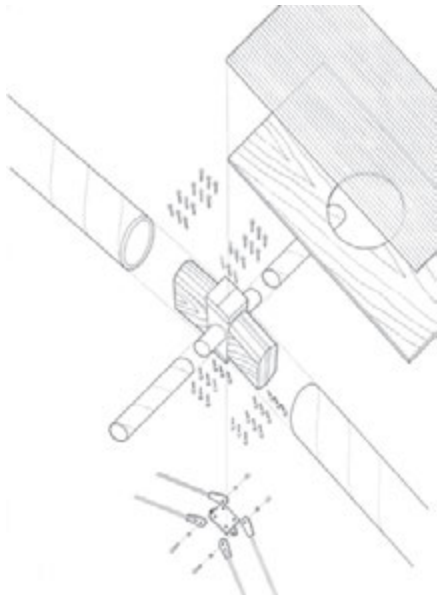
Paper Dome – detail of the connection between the paper tubes and timber joints, 1998
